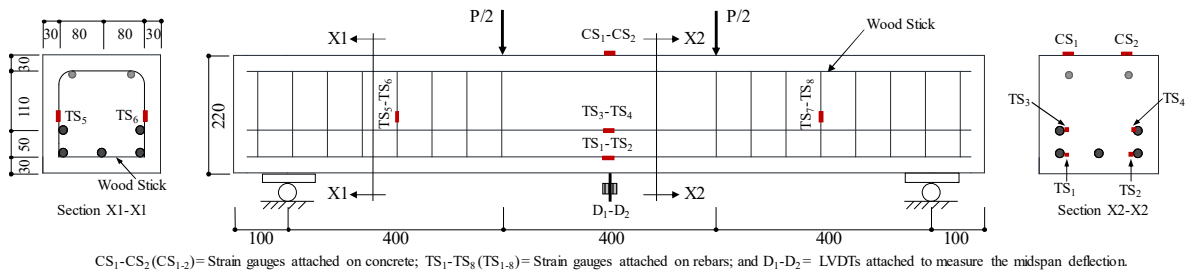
Strain gauges on concrete and rebars in the tested beam (all dimensions are in mm).
